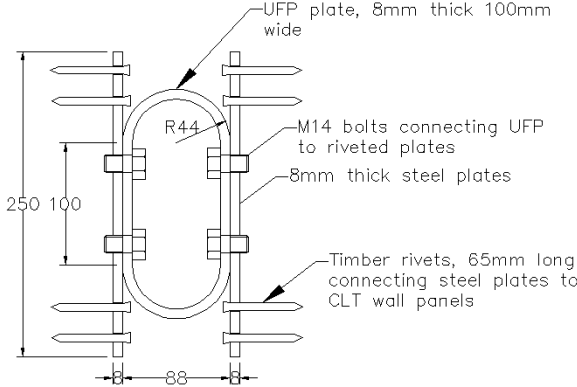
Detailing of UFP devices. UFP bolted to a steel plate that is riveted to the edge of the wall panels
